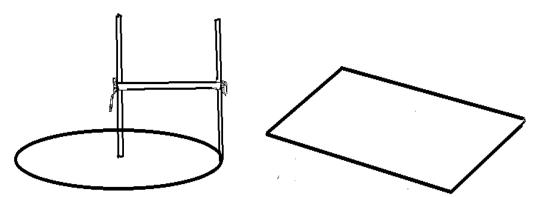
An outline of a cone house Figure 16: An outline of a rectangular house
